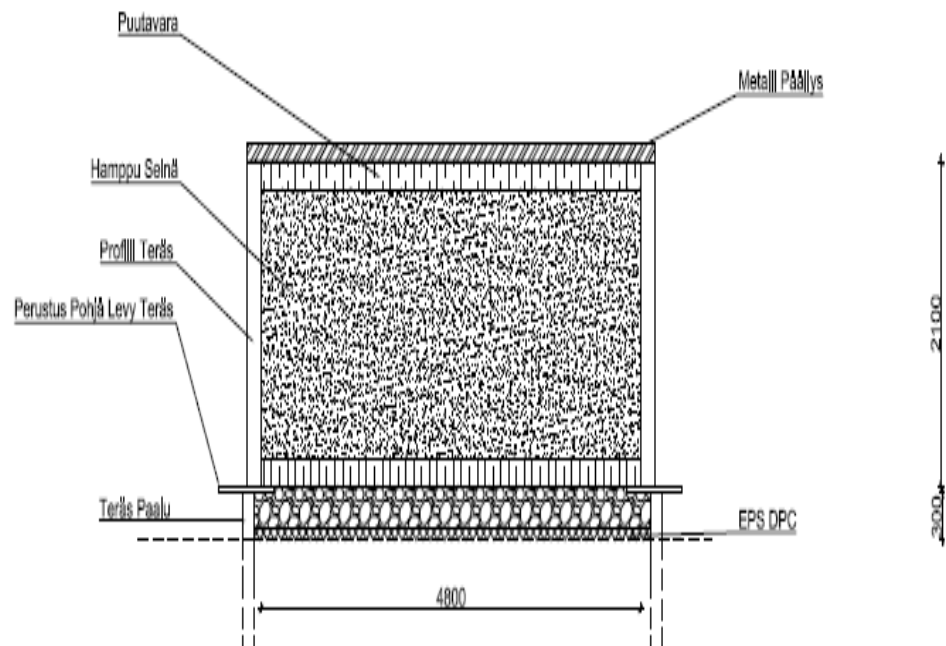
The front view of the wall after EPS Damp proofing for moisture protection from the ground
